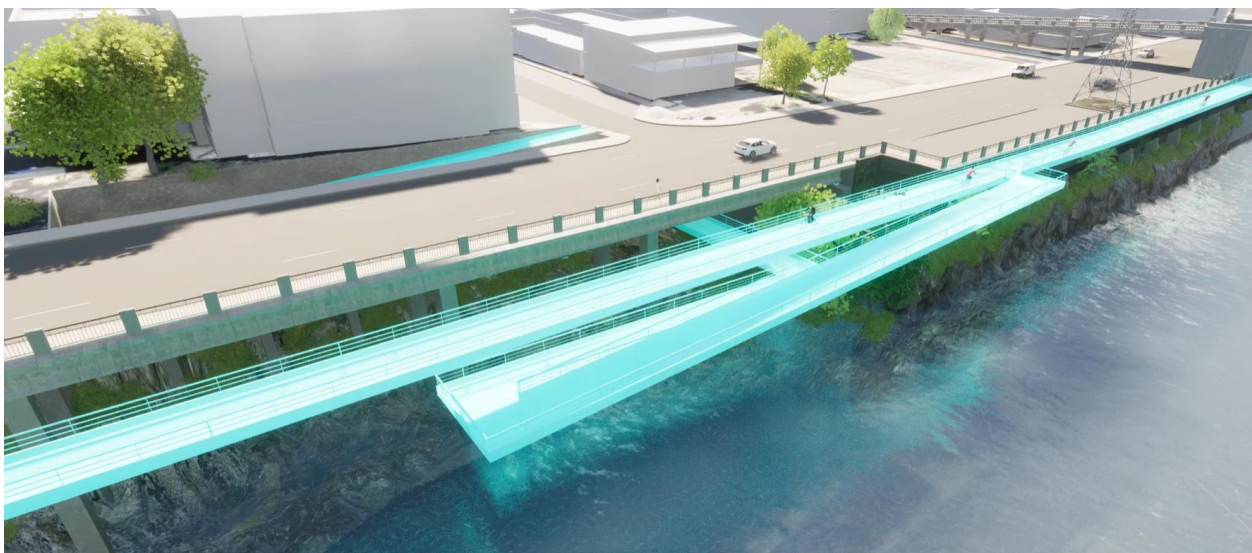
illustrates the High Route alternative. This alternative would be constructed at the same grade as McLoughlin Boulevard and adjacent to the existing viaduct on a fully separated structure. The connection to McLoughlin Boulevard will occur near 10th Street and reconnect near the future Tumwata Village development with additional opportunities for connections back to McLoughlin Boulevard further described in the section below.
